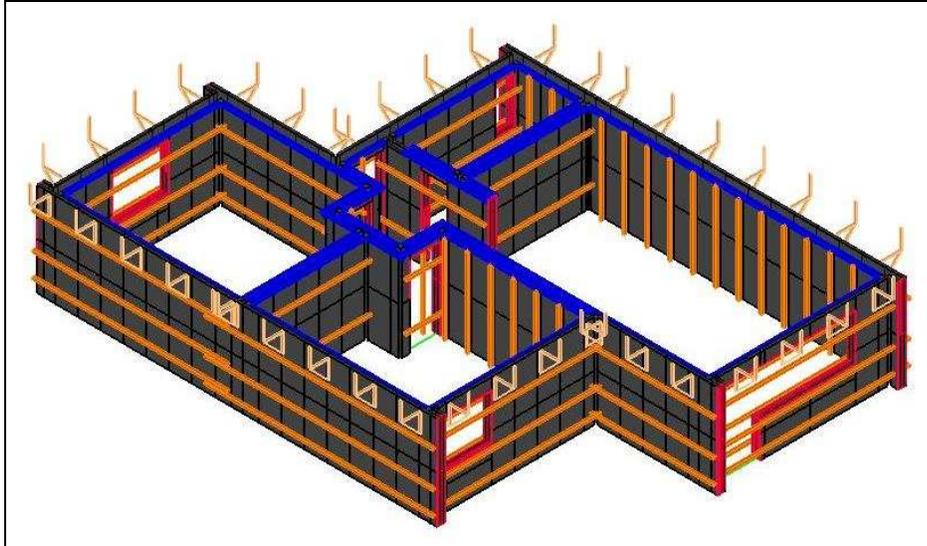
Results of the Phase Modulation of wall formwork (gray), tops of doors and windows (red), aligner (orange), scaffolding (terracotta), joints of walls with slab (blue).
